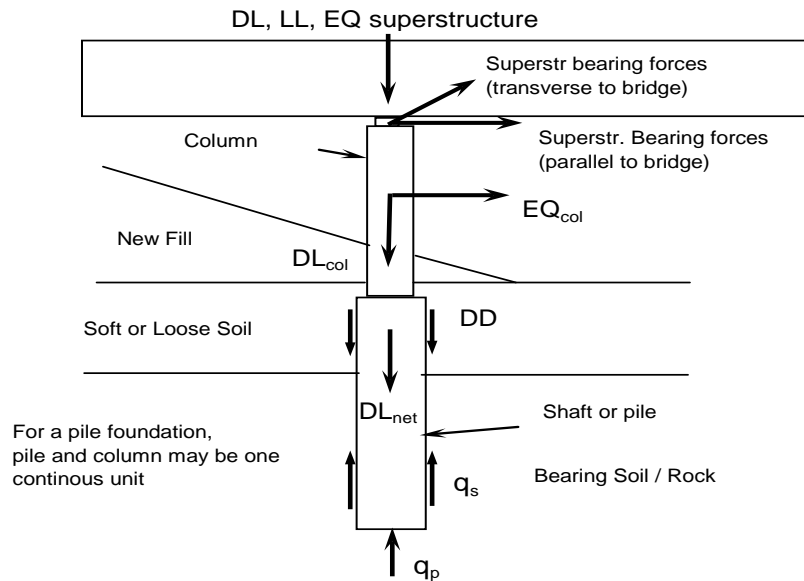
Definition and Location of Forces for Pile Bent Foundation
